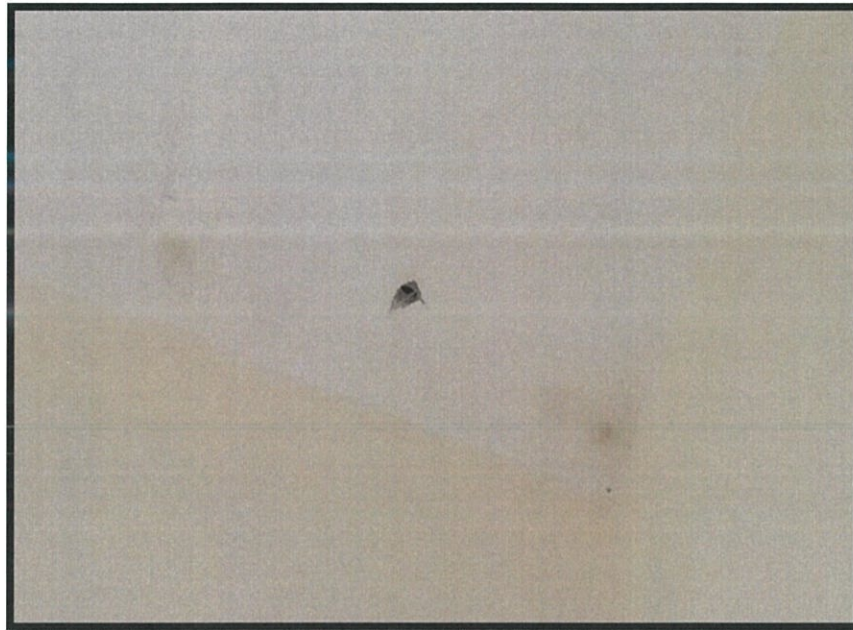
Roof Leakage. (Source: Hijauan Damai Sdn. Bhd.)
